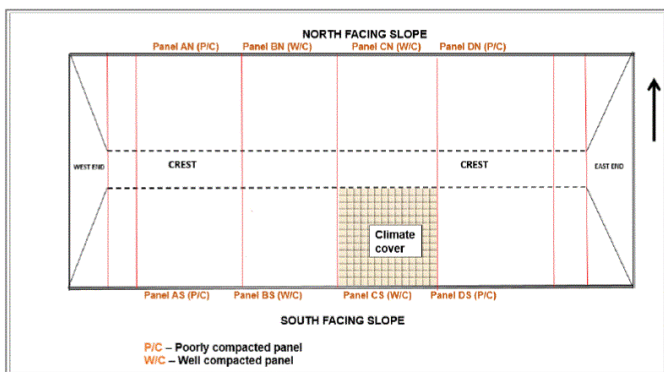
BIONICS Full-scale embankment test site, construction schematic.
